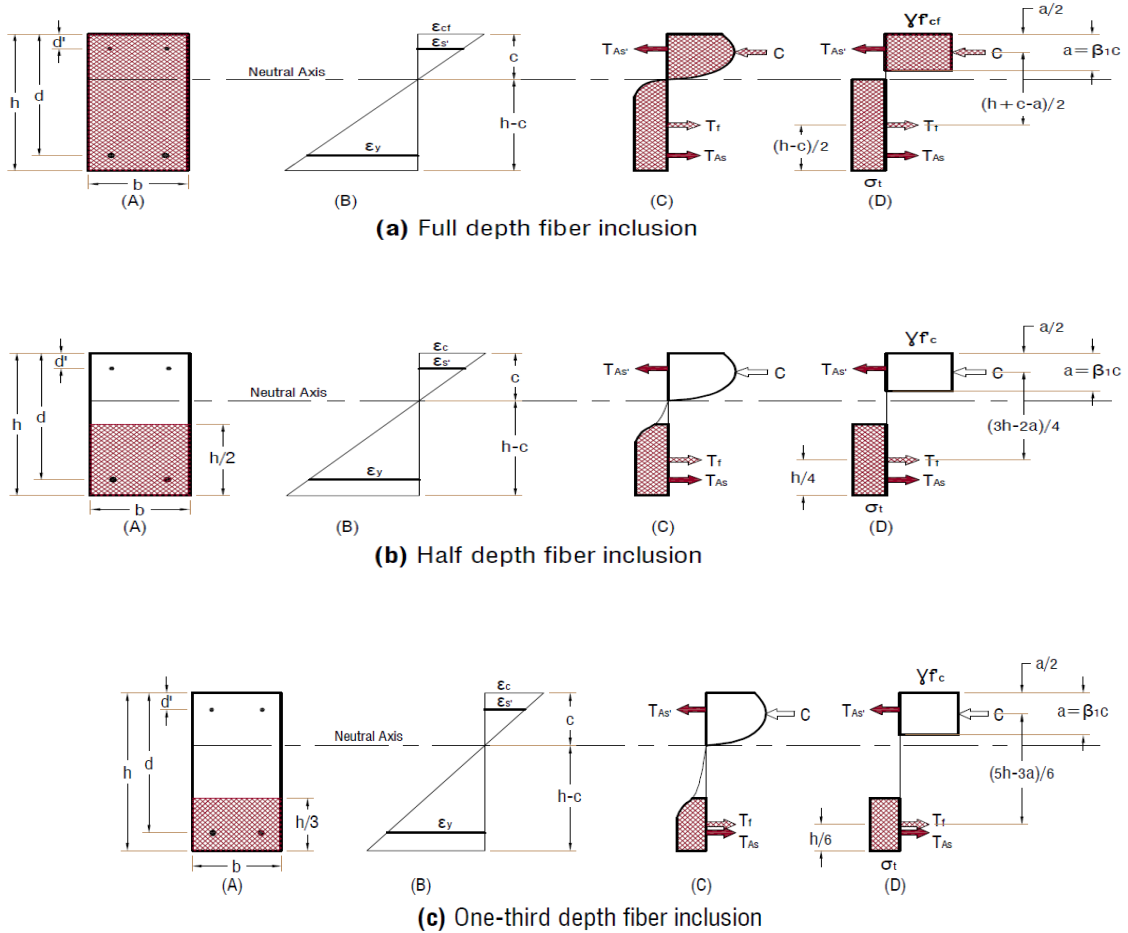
Strain and stress distribution for the cross section of conventional reinforced fiber concrete beams
